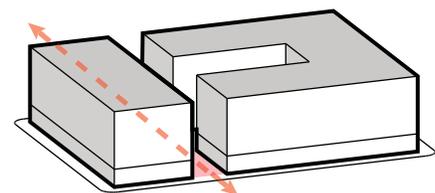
PE2 - PUBLIC ACCESS THROUGH OPEN SPACE CONNECTION
